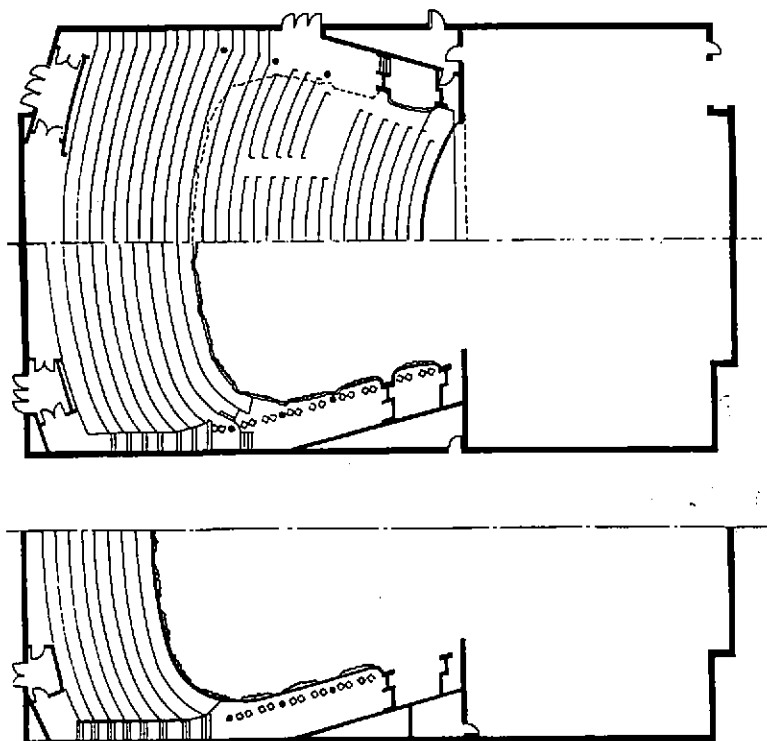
Orchestra and balcony plans of the completed Princess of Wales Theatre.
